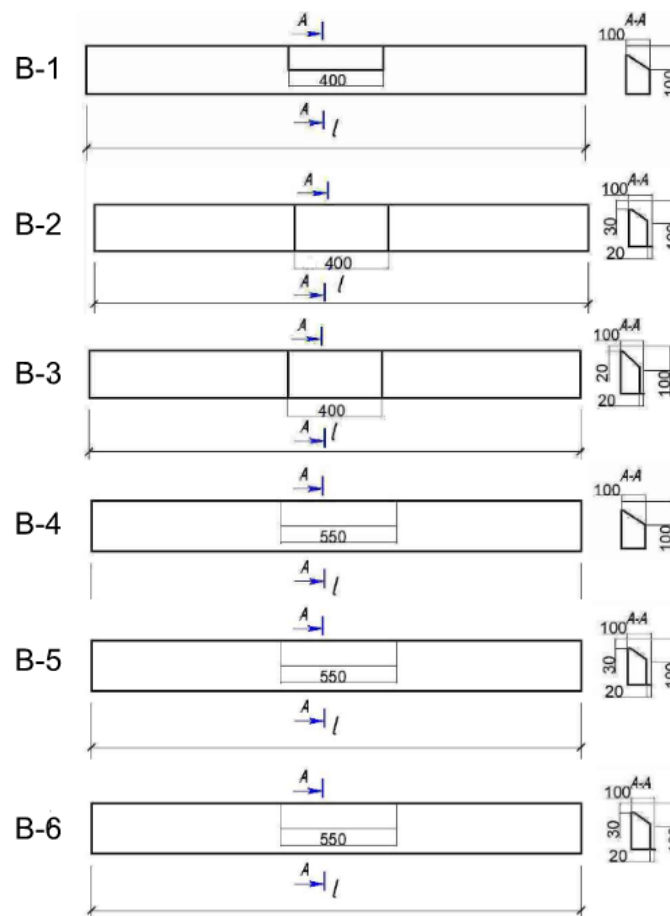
Scheme of damage to a reinforced concrete beam
